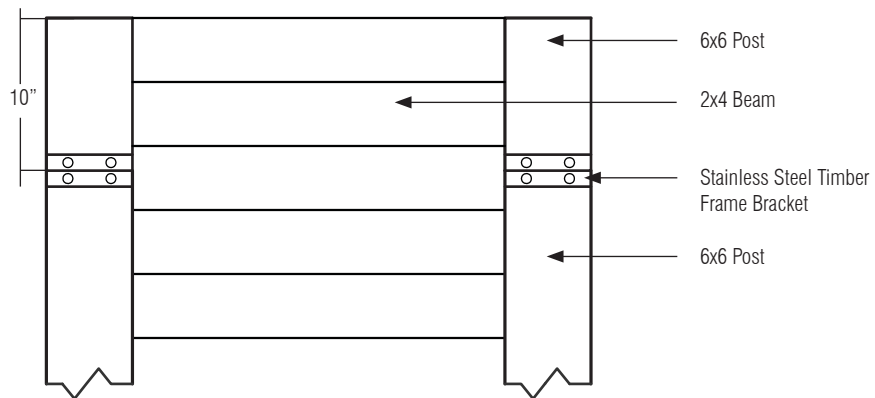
Handicap Garden Bed Detail Inside Brackets
